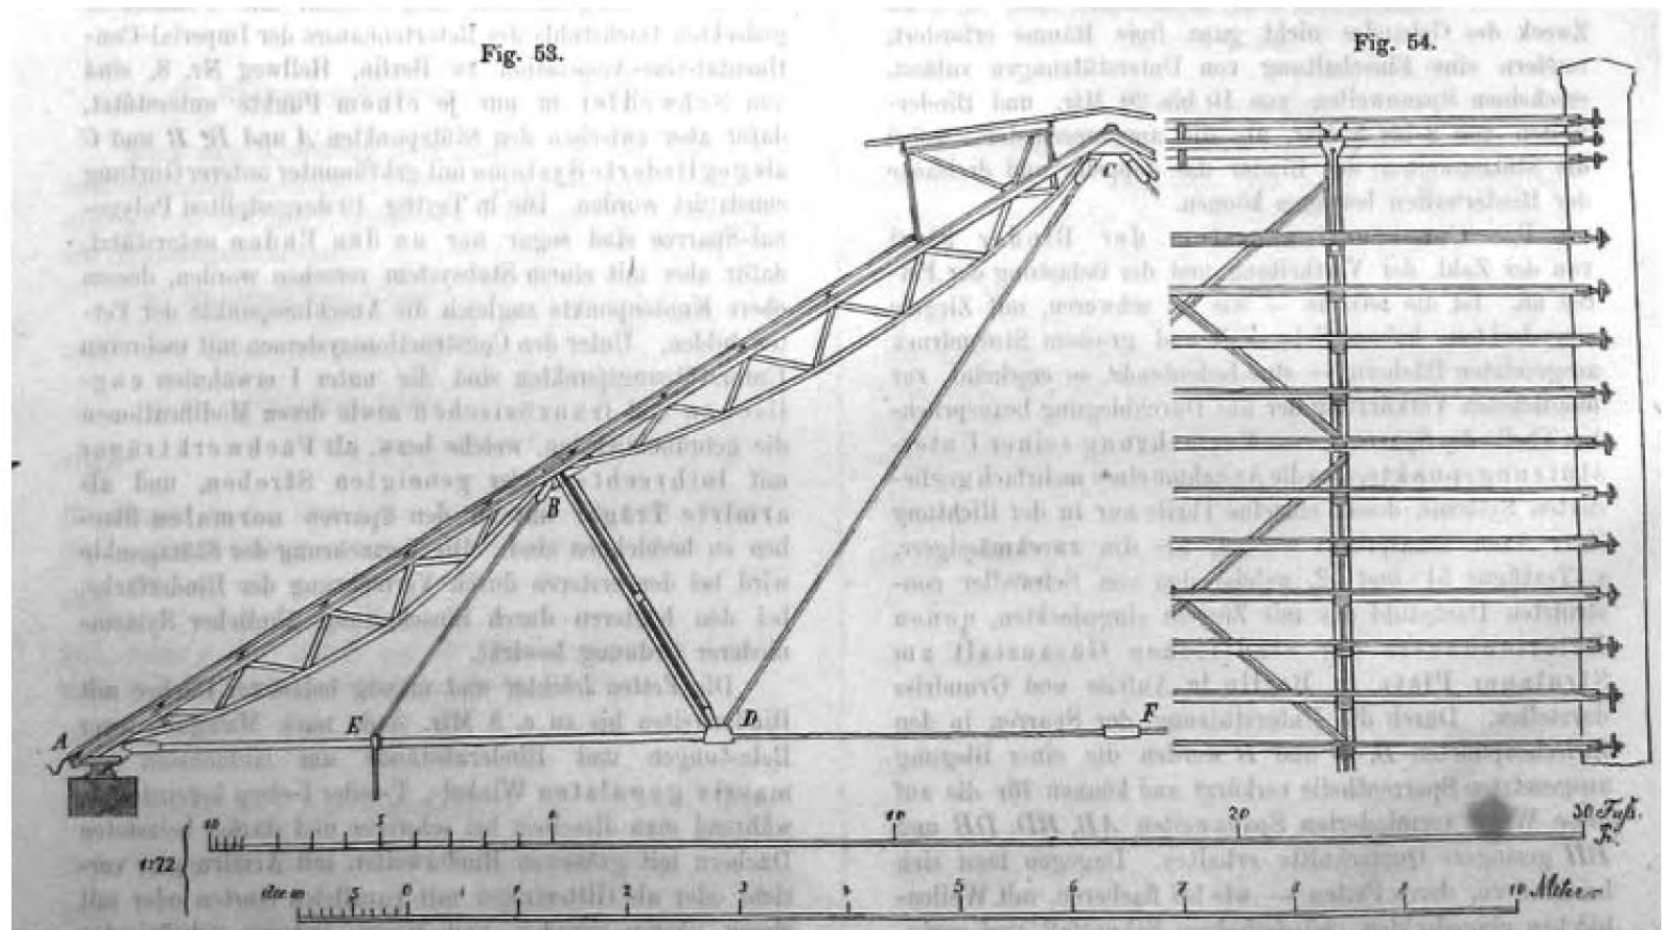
Berlin, roof of a workshop of the Imperial Gas Association (designed by J. W. Schwedler). Transverse section (left) and ground plan (right). From Heinzerling 1876, p. 20.
